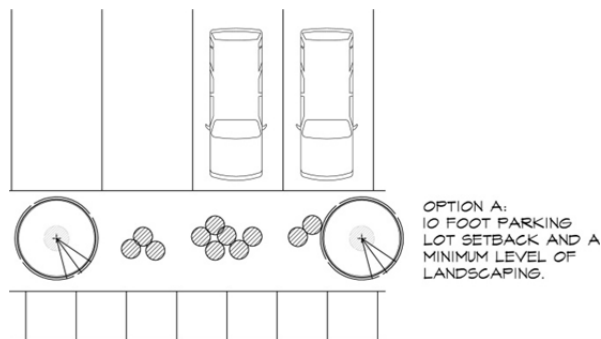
Typical 10' Landscape Strip – Mixture of Plant Sizes
